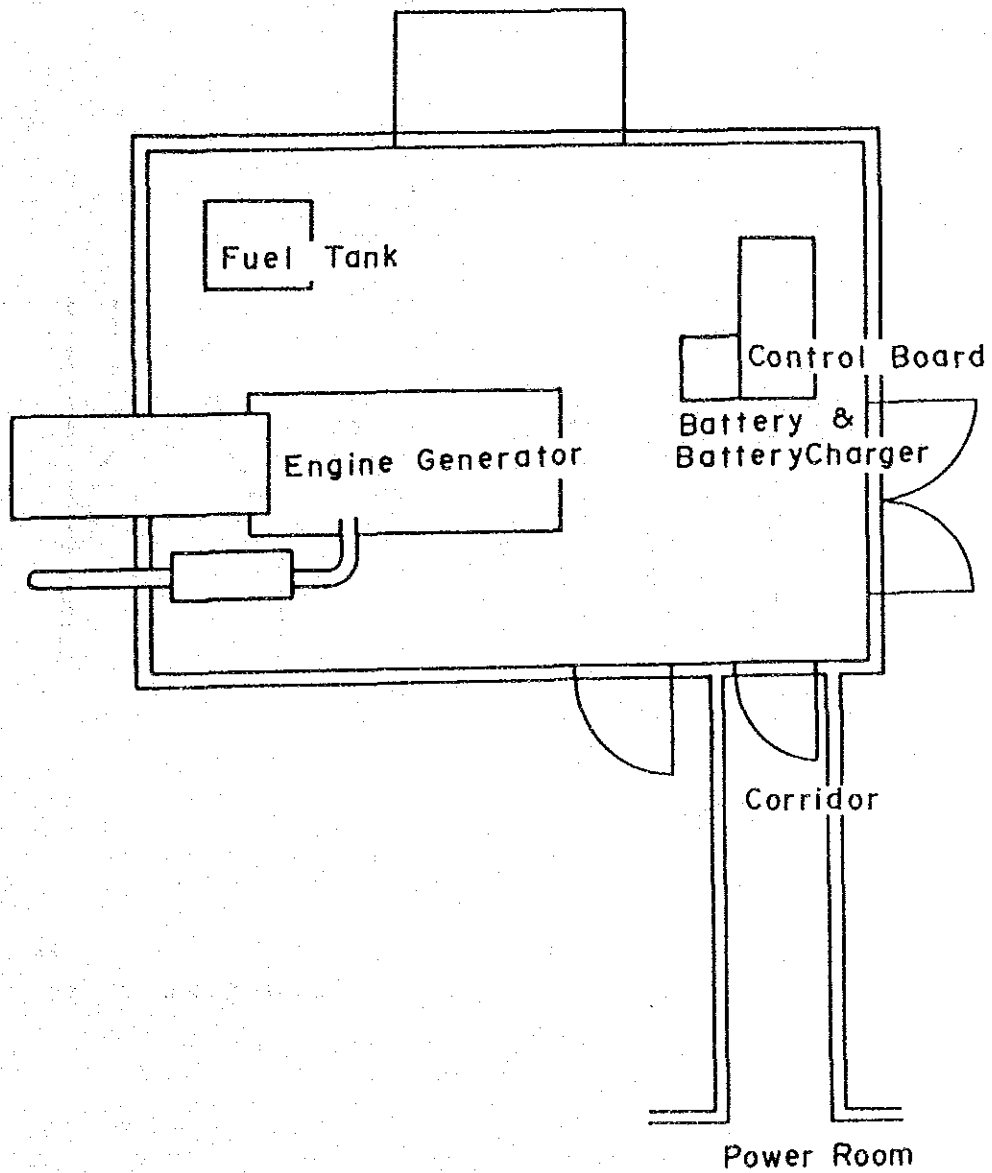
Layout of Equipment in Engine Generator House
